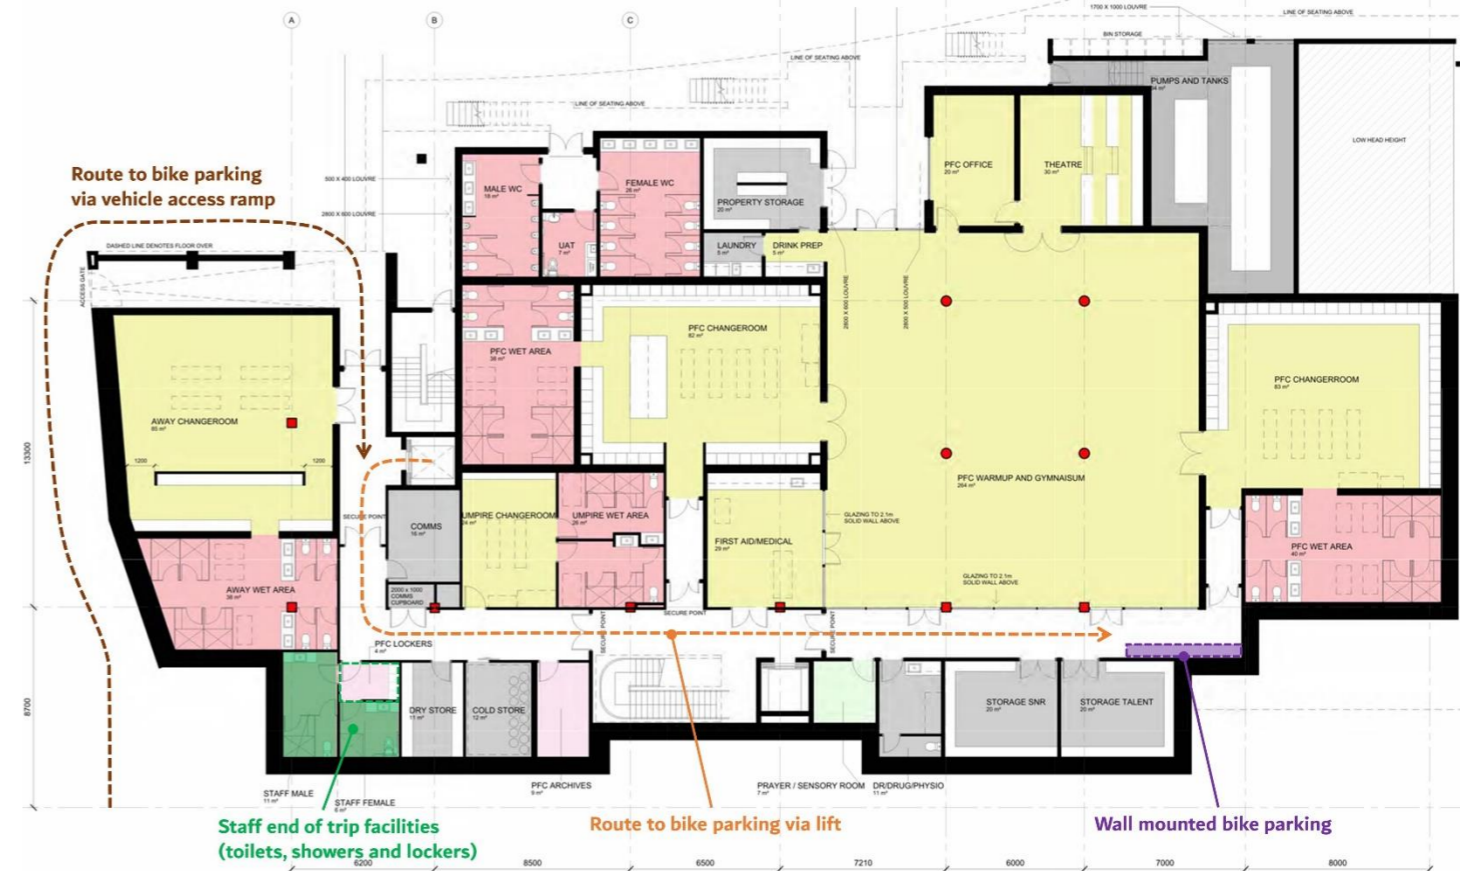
Location of staff bike parking and end of trip facilities (base plan source: Hames Sharley, Rev N dated 14/06/23)
